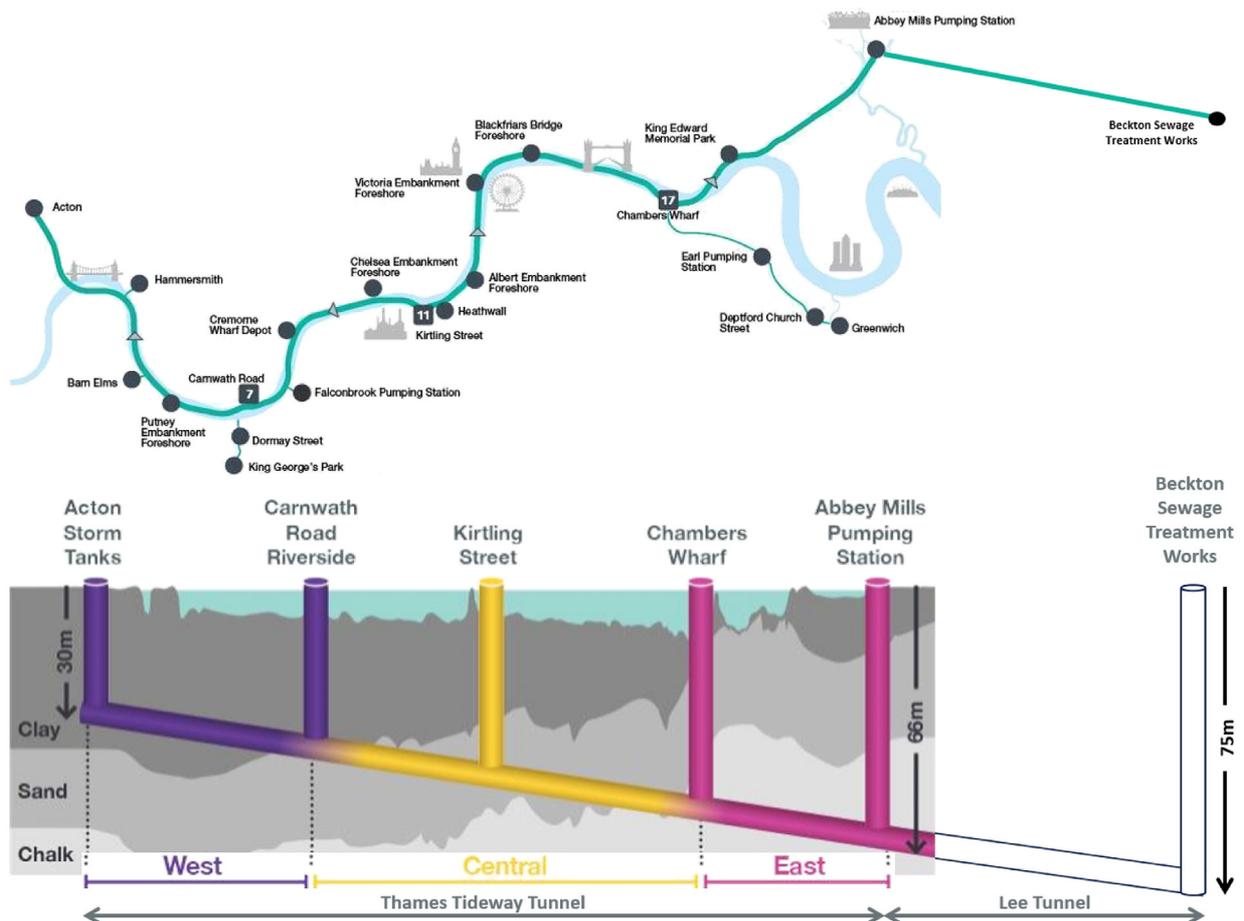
| London Tideway Tunnels route and sites with arrows indicating tunnel drive directions (top), main tunnel longitudinal schematic with drive/reception shafts and the prevailing geology (bottom).
